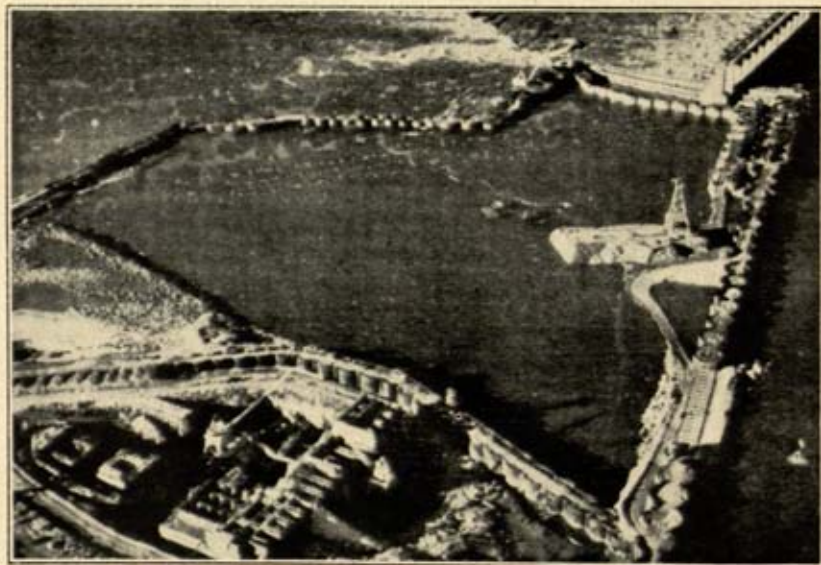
Final cofferdam for the McNary Dam. (*Engineering News-Record*.)
